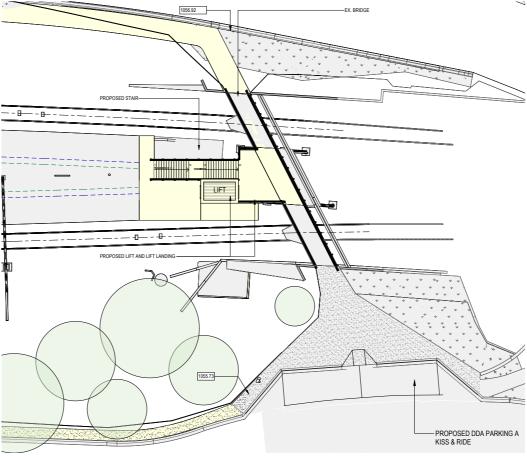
Option 3 - Proposed modifications to existing footbridge - upper level plan. Source: DesignInc February 2023.
